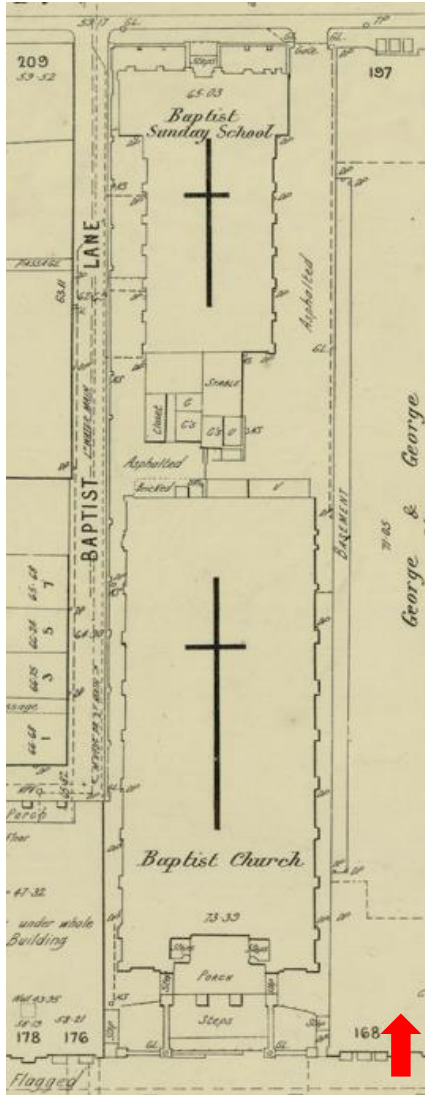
(above): Close detail of the Melbourne and Metropolitan Board of Works Plan showing the front entrance to the Baptist Church on Collins Street. (Source: SLV ID 9911617753607636)
